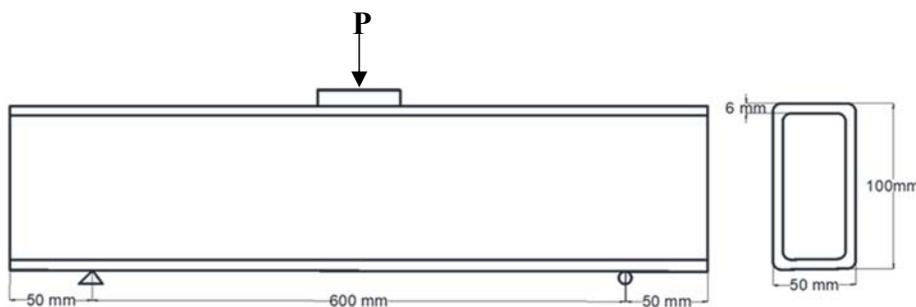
Details of RHS steel beam: (a) Longitudinal section and (b)cross-section.
